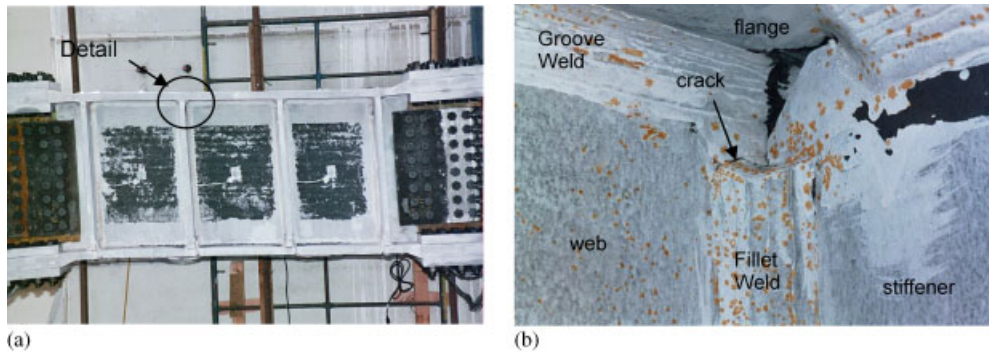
Type 1 link at  $\Delta = 345$  mm: (a) deformed configuration; and (b) crack at end of stiffener/web fillet weld.
